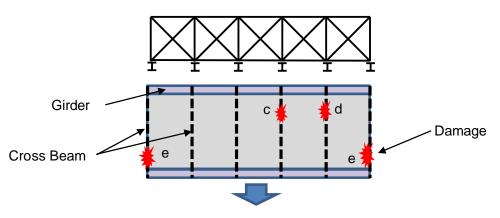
Damage (Rivet / HSFG) (Main Girder)
